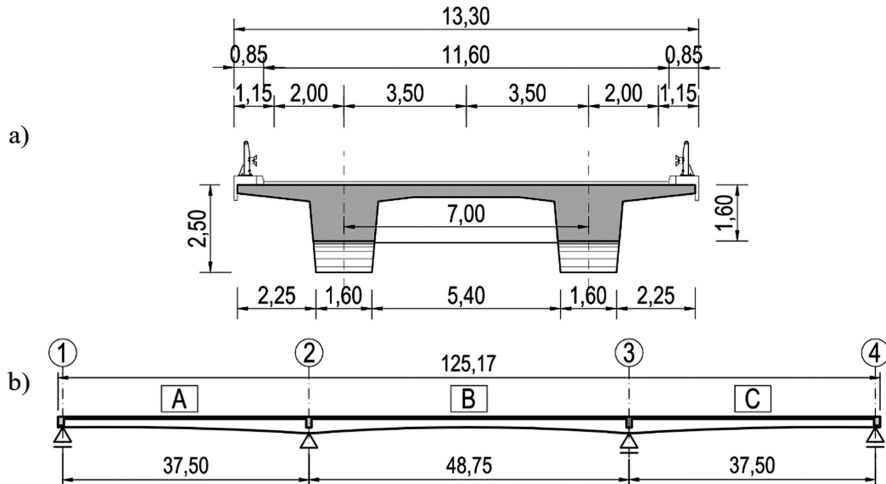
Geometry of the MS-03 bridge structure (dimensions in [m]): a) cross-section, b) longitudinal section
